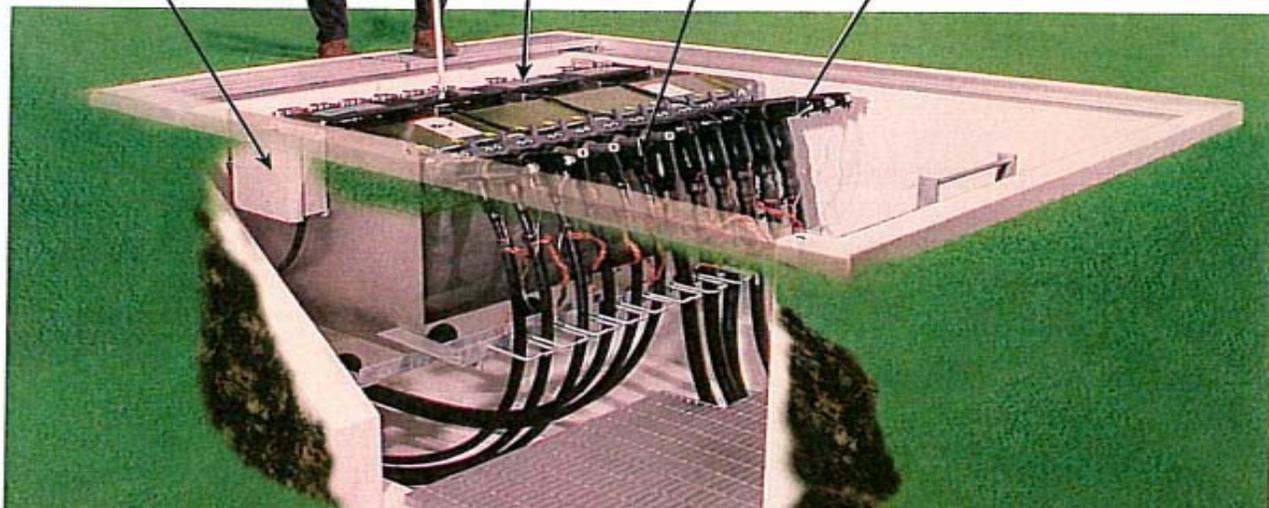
Typical Cross Section View of S&C Low Profile Pad Mounted 15kV Distribution Switchgear.
